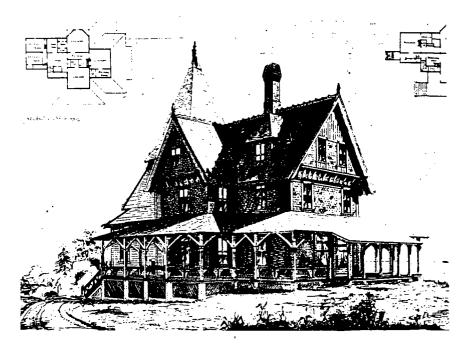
Stone and Carpenter, Country House at Nyatt Point, R. I. (American Architect, 1876).
